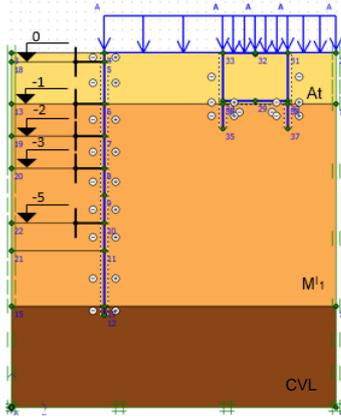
Cross sections in the DE elevation, transverse to the tunnel of the Marquês, underground
